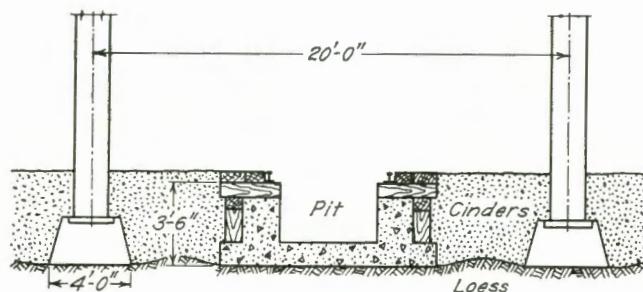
CROSS-SECTION THROUGH ONE OF THE ENGINE PITS
